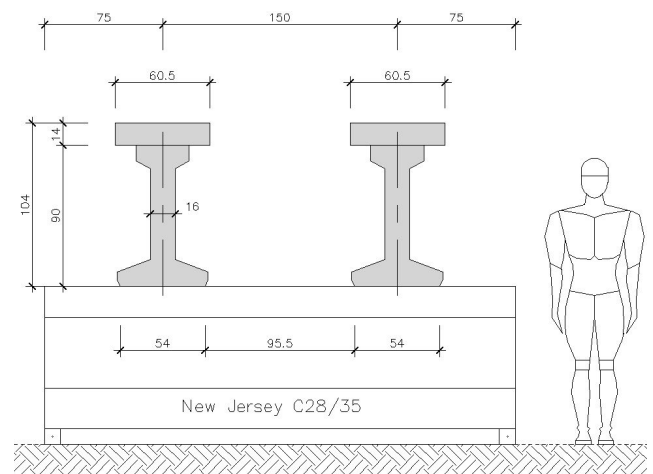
I-shaped PC beams on RC New Jersey elements [cm].
